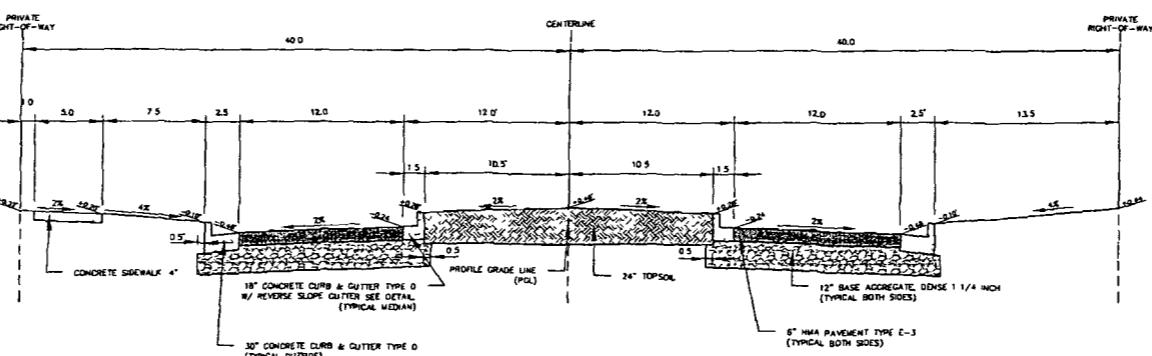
EXHIBIT J - SUBDIVISION ROADWAY TYPICALS		TOWN OF SOMERS		SOMERS MARKET CENTER
